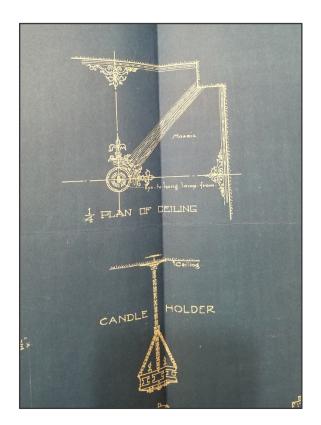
& 6 Plan of ceiling detailing candleholder; existing ceiling.
